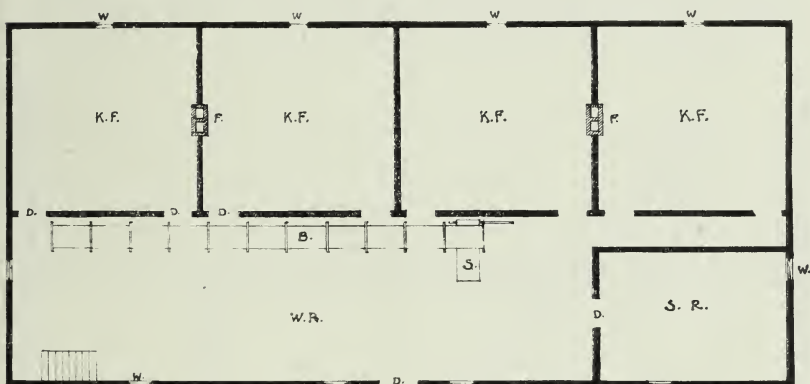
Fig. VII. Four-kiln evaporator, second-story plan. K.F., kiln floors. F., flues from furnaces. W.R., work room. S.R., storage bin. B., bleacher. S., Slicer. D., doors. W., windows.
